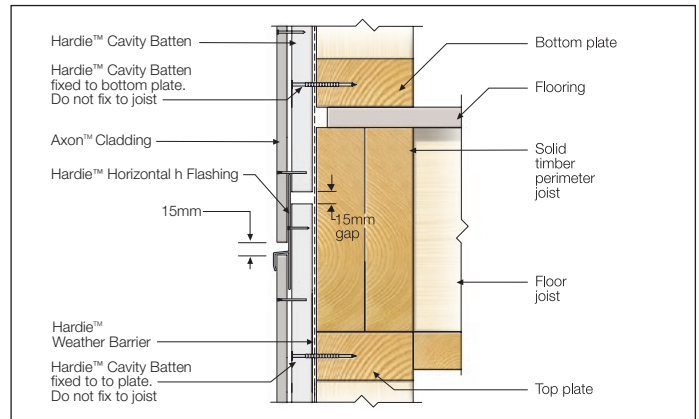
FLOOR LEVEL JUNCTION - HORIZONTAL H FLASHING
